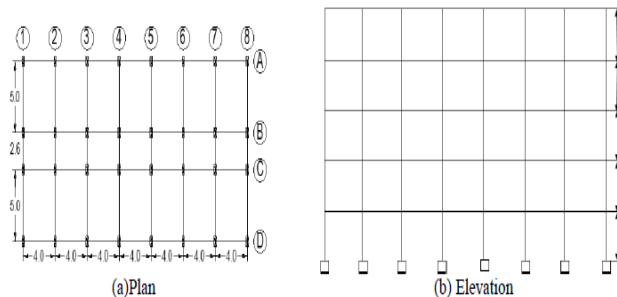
General Layout of Building under study, (all dimension are in meters)
